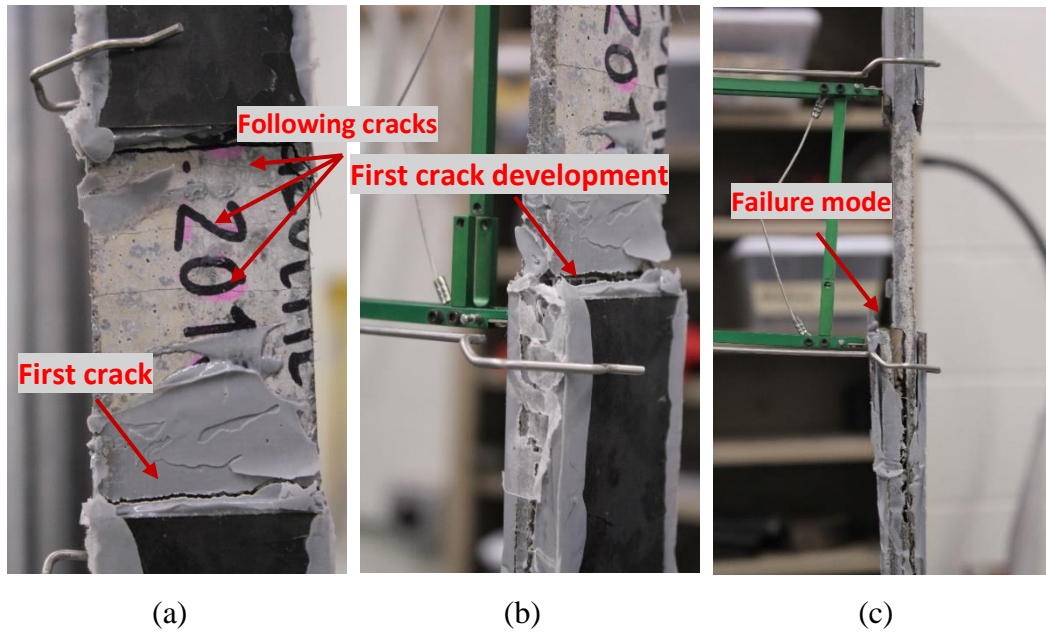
Failure mode of coupon GLT-G6-1 subject to tensile test: (a) first and multiple cracks in the mortar; (b) enlargement of first crack; (c) ultimate failure.
